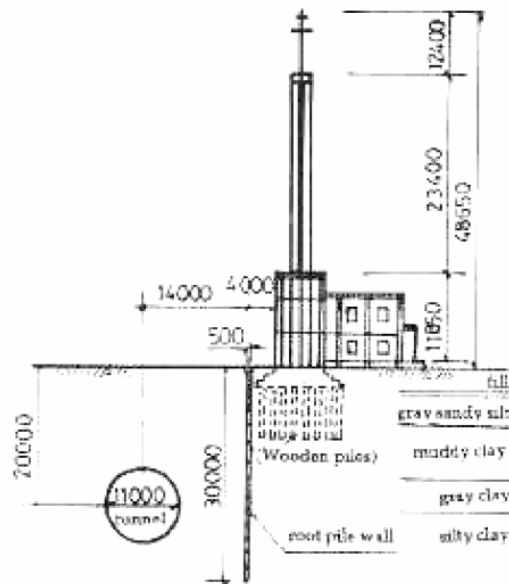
Root piles protecting the Shanghai observatory (Chen et al., 1998).
